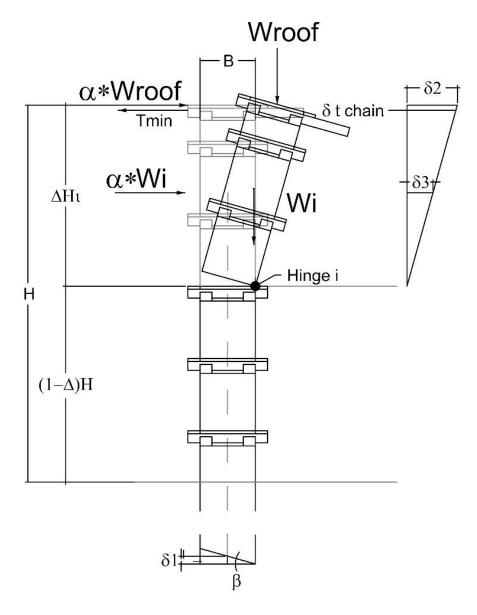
Roof force + Wall force - Overturning Blocks - Tmin
